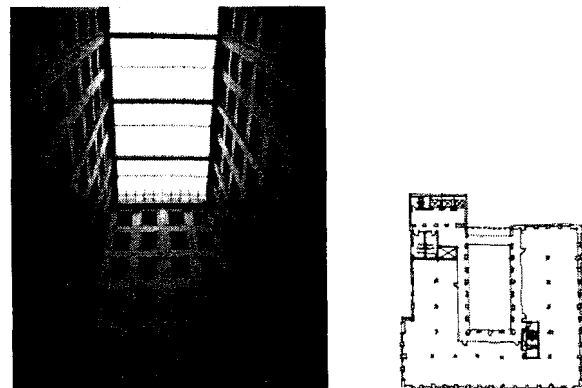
Atrium and typical floor plan, Wainwright State Office Complex, Mitchell/ Guirgola, Architects in association with Hastings and Chivetta Architects, 1981.
